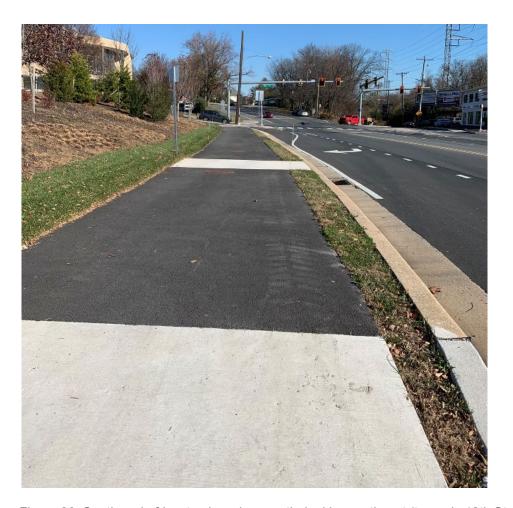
South end of Incyte shared use path, looking northeast (towards 18th Street intersection)
